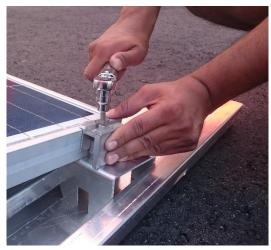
Torque KB Konnect End Clamp, with End Block
